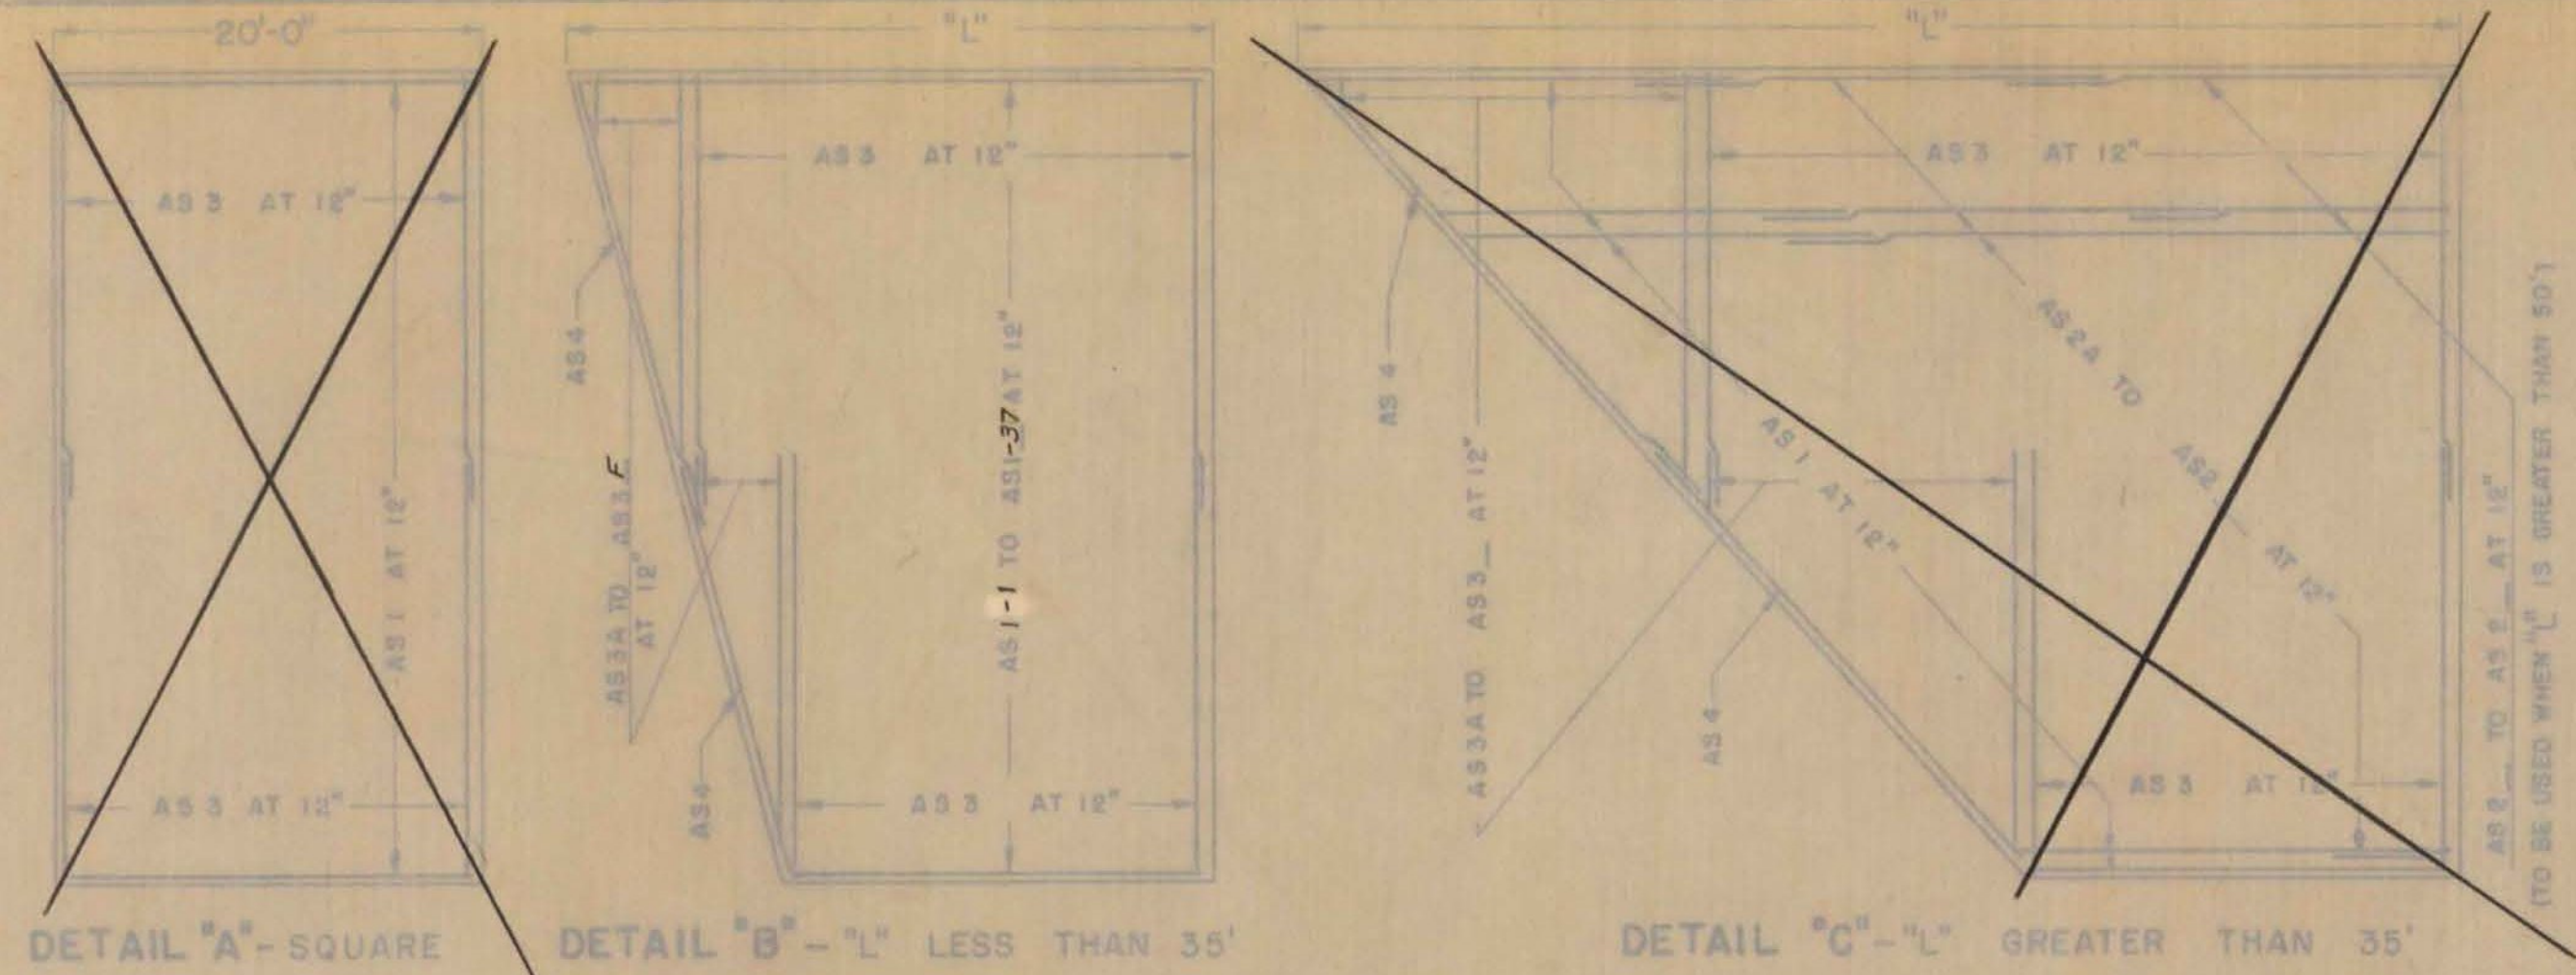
DETAILS OF APPROACH SLAB FOR 36'-8" FOOT BRIDGE
